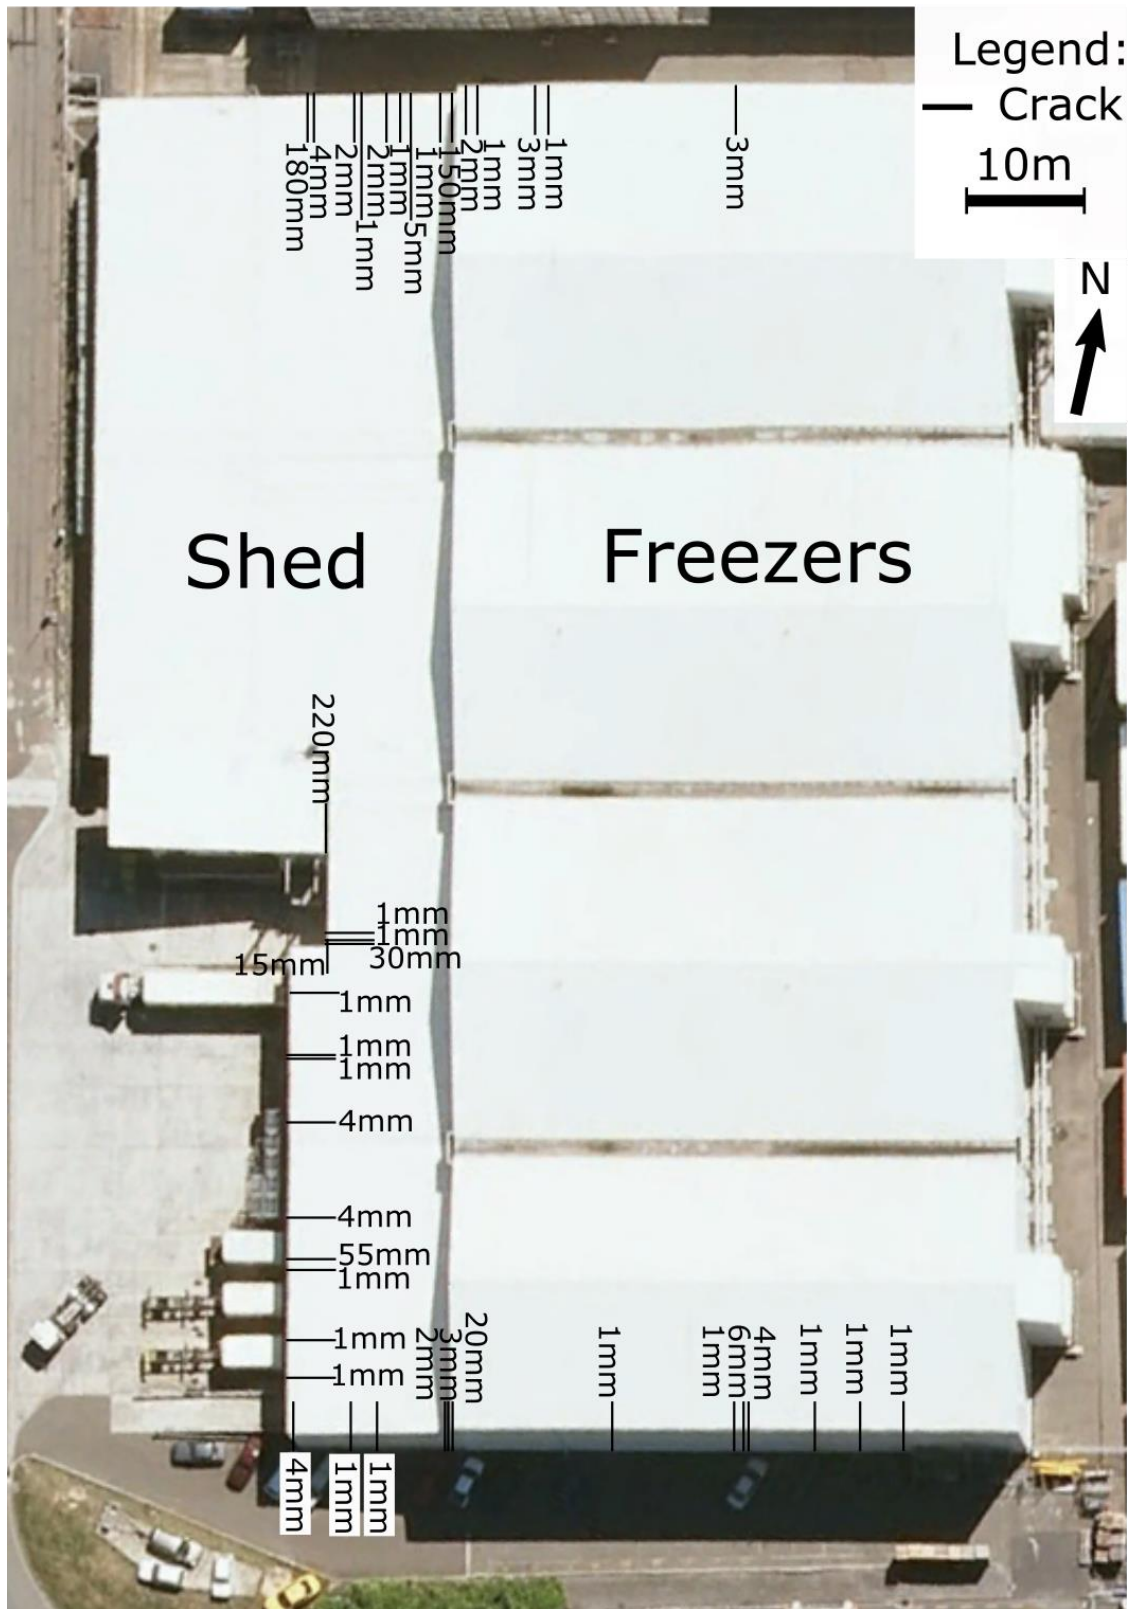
Location and width of lateral ground movement-induced cracks in the RC concrete walls at the base of the exterior building walls of the CS building. Crack openings are parallel to each wall.
